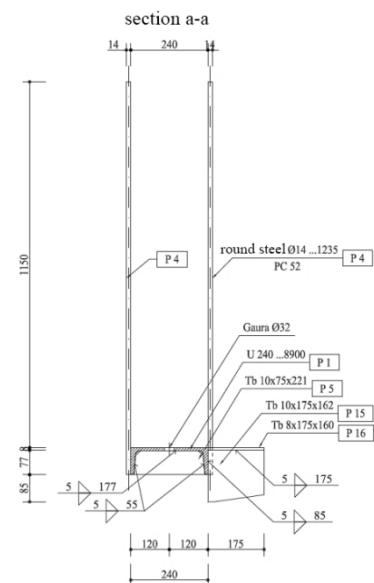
Metallic confection done in workshop – longitudinal profile+stirrups
